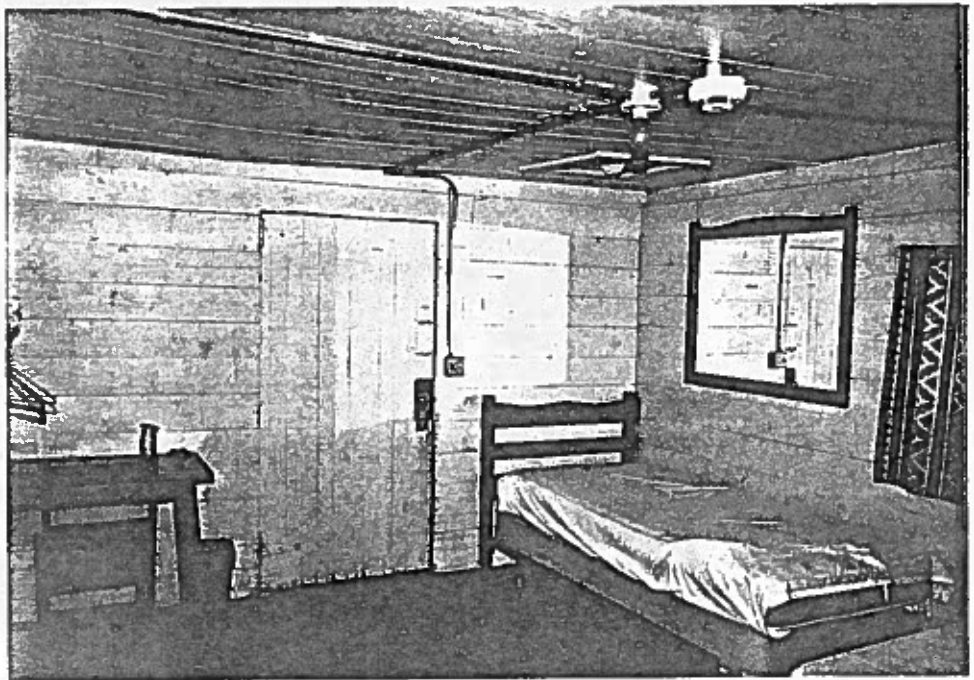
Looking northeast at the interior of cabin 5A. Note the electrical conduit run along the ceiling and walls, even though there is a full attic above.
